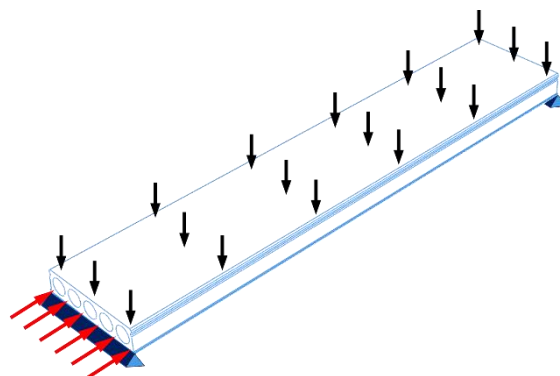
Loads and boundary conditions of channel prestressed concrete slab.
